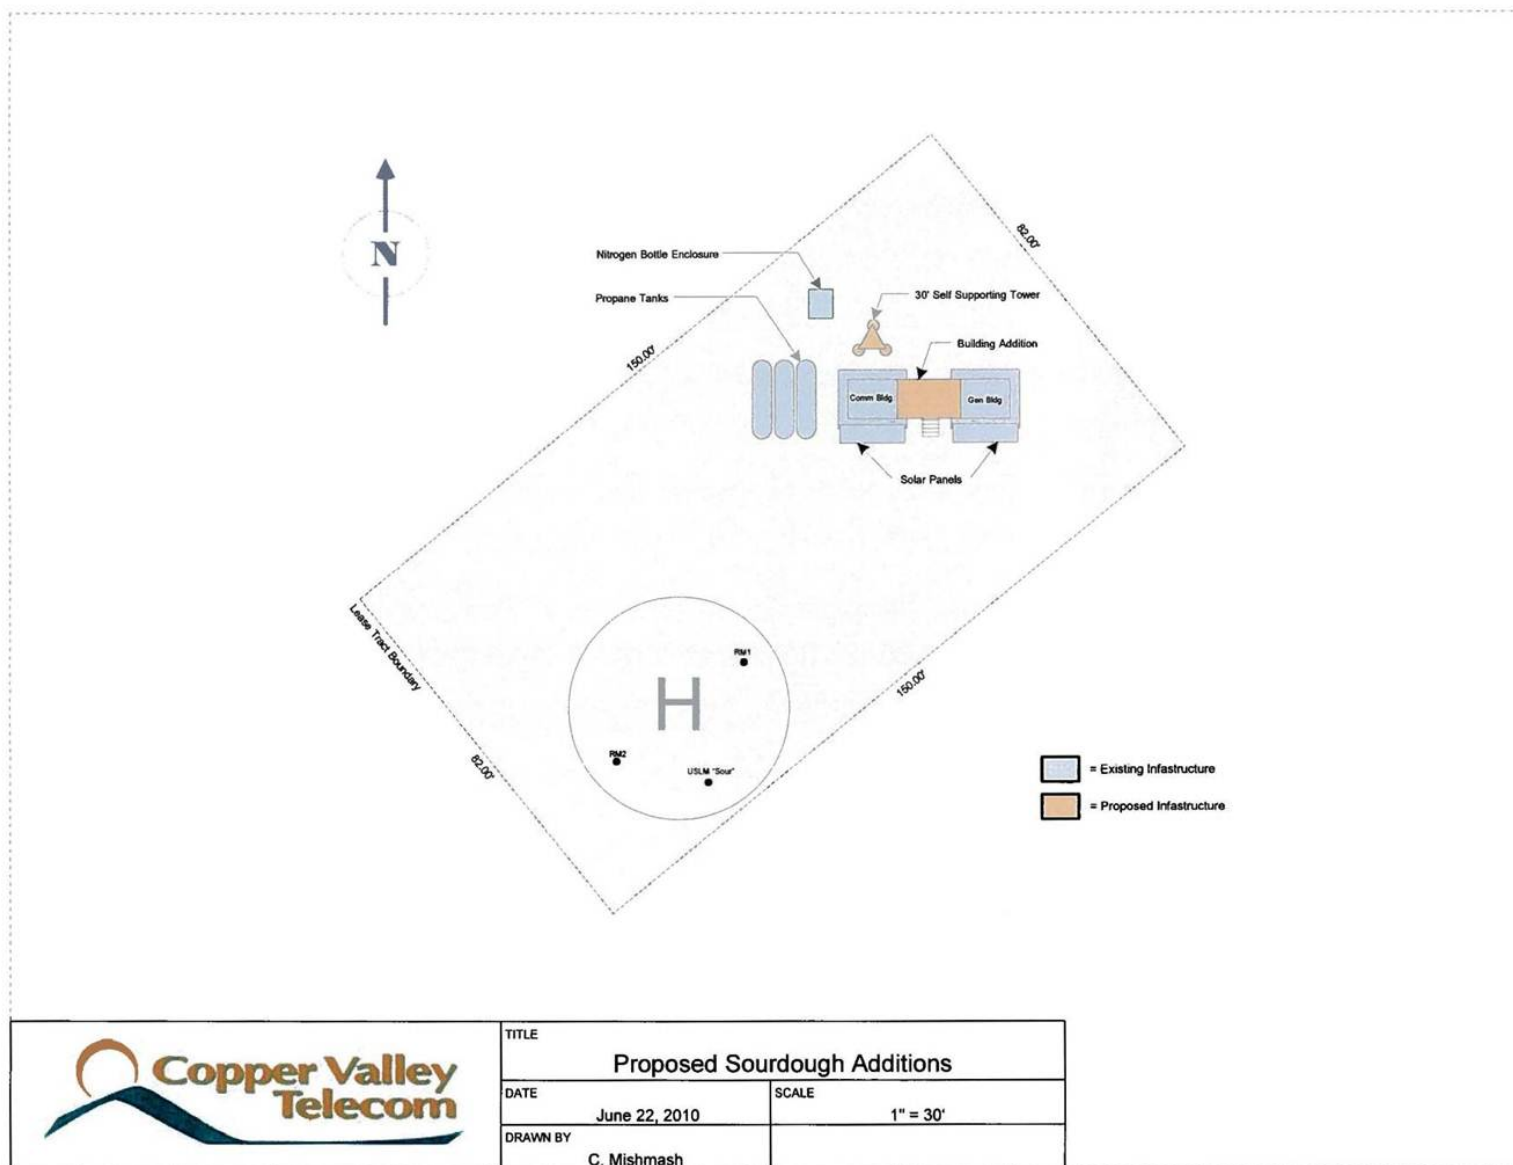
Proposed Sourdough Ridge Communications Site Plan
